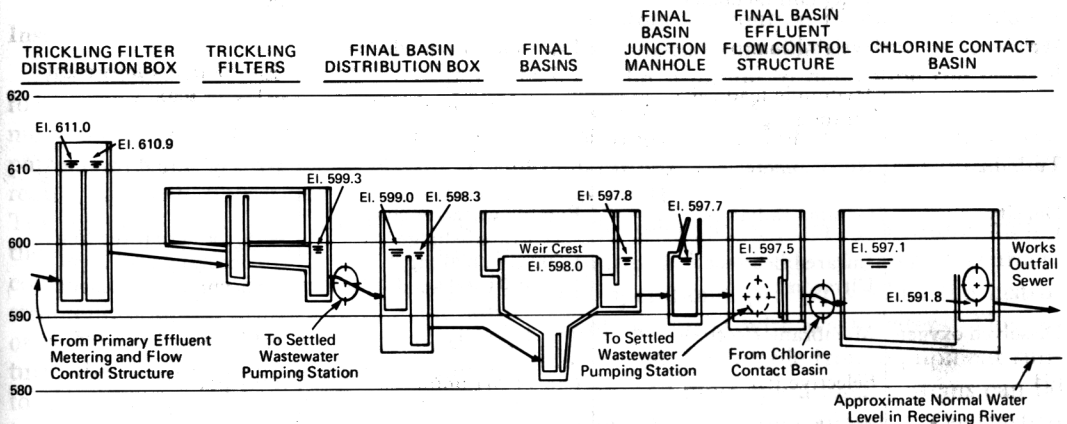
Typical hydraulic profile for a trickling filter plant. Water surface elevations are as shown when flow is 85 000 m³/d (24 mgd).
